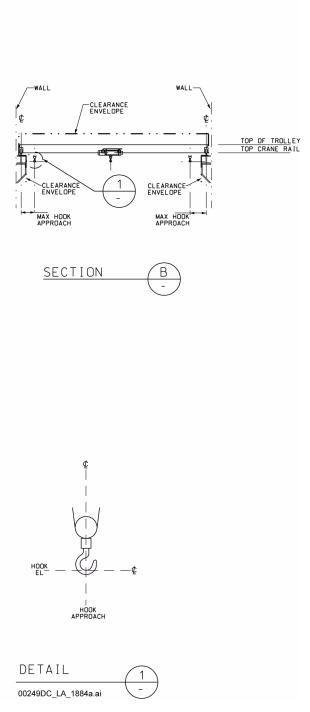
Closure Support Room Crane Mechanical Equipment Envelope
